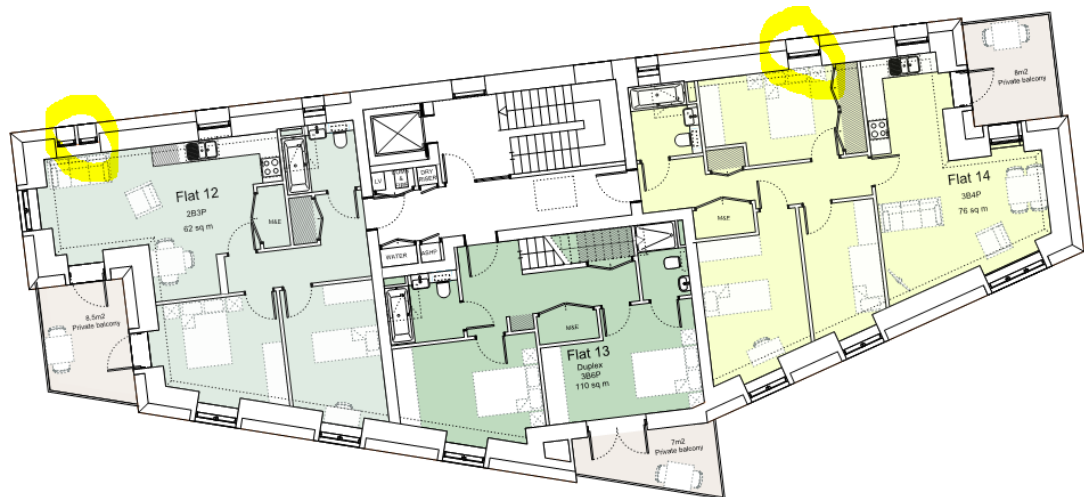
Typical floor plan showing bedroom windows and high level windows with clear glass. All other windows are opaque or located at ground floor with no views into the school
